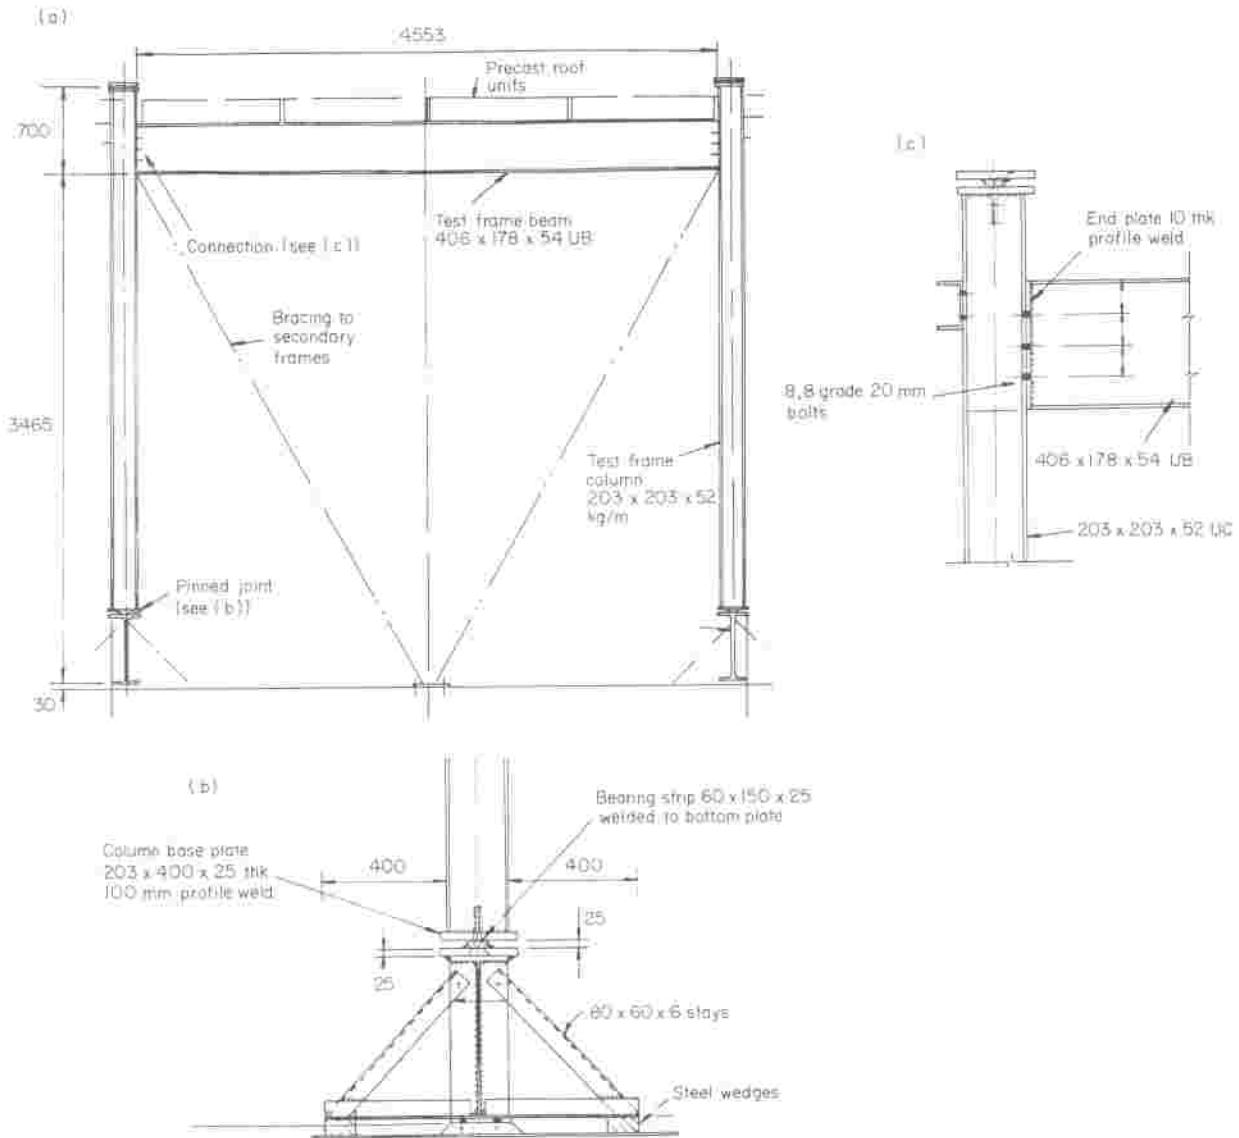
Principal features of test frame. (a) Front elevation, (b) column joint detail and (c) connection detail.
